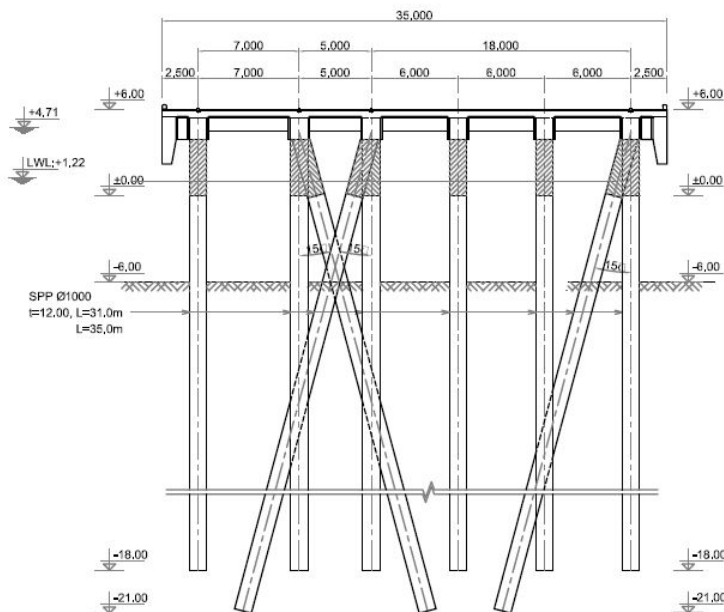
Typical Cross Section of the Unloading and Discharging Berths for the Stockyard
